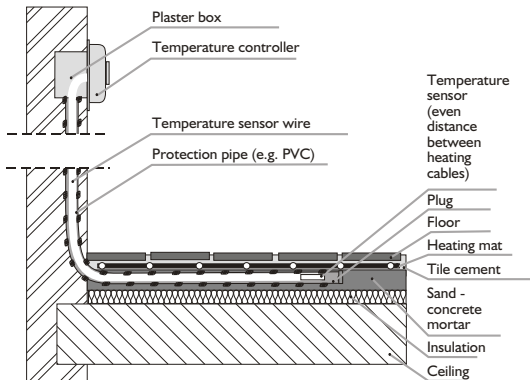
Installing the floor temperature sensor with Elektra heating mats used.
